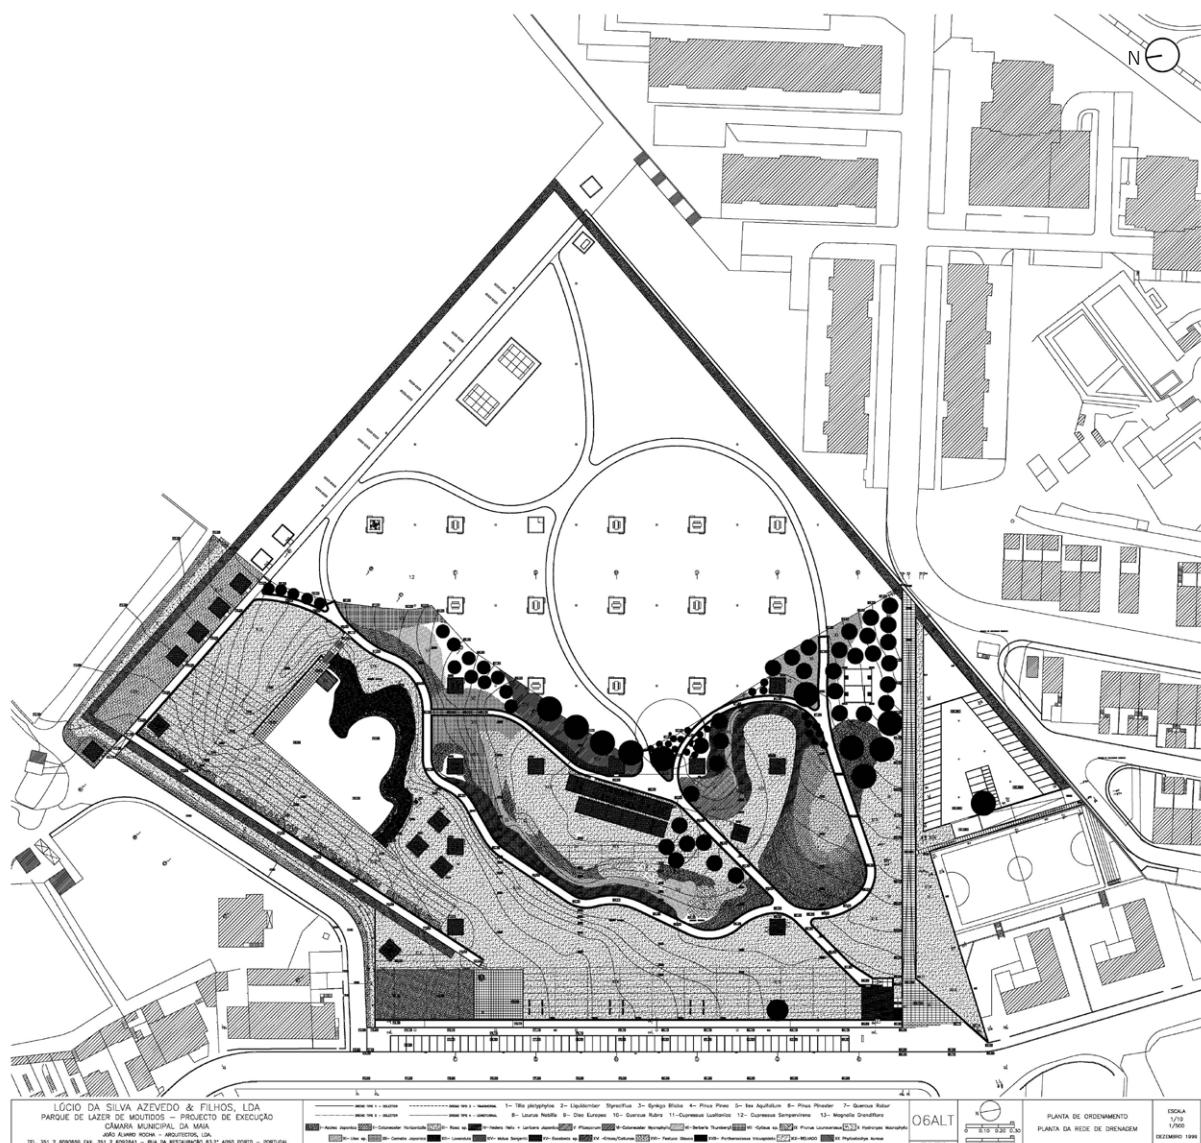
Site plan. E. 1/500 (AutoCAD). Author: Rocha, J. A., 1998 (Source: Execution project, 2021).
